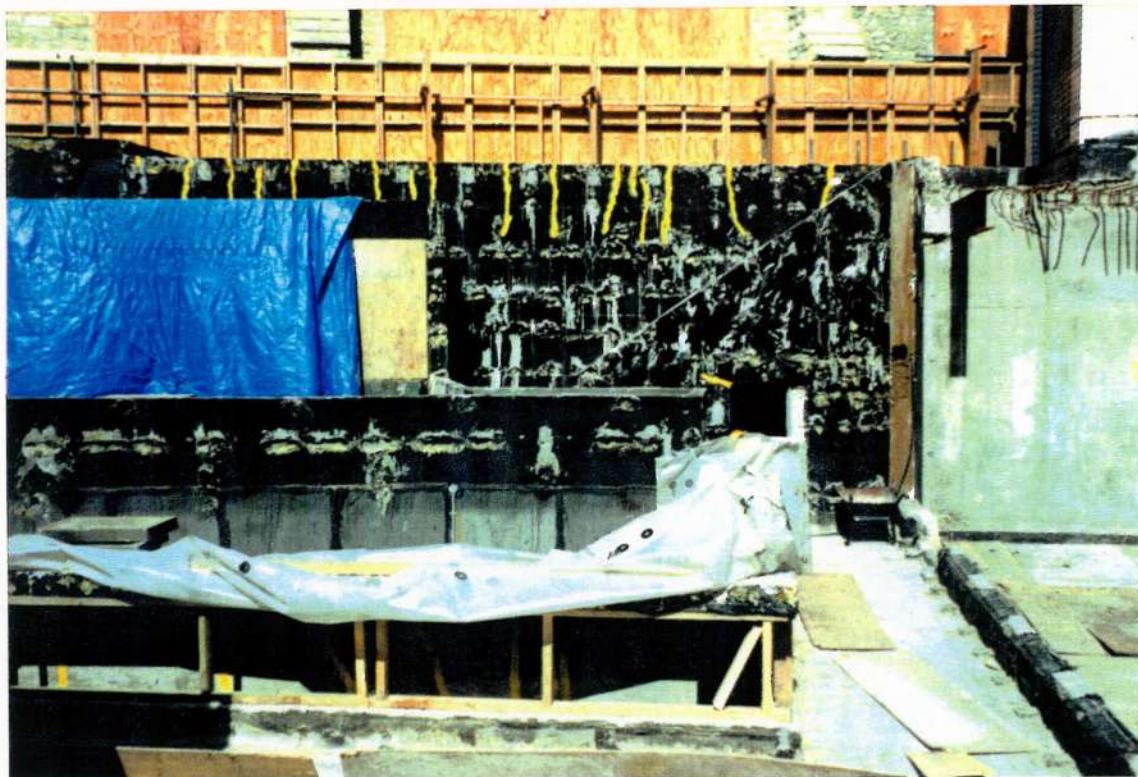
Part east elevations of walls B,D,J & L at north end of garden (EC/TL1/4)
